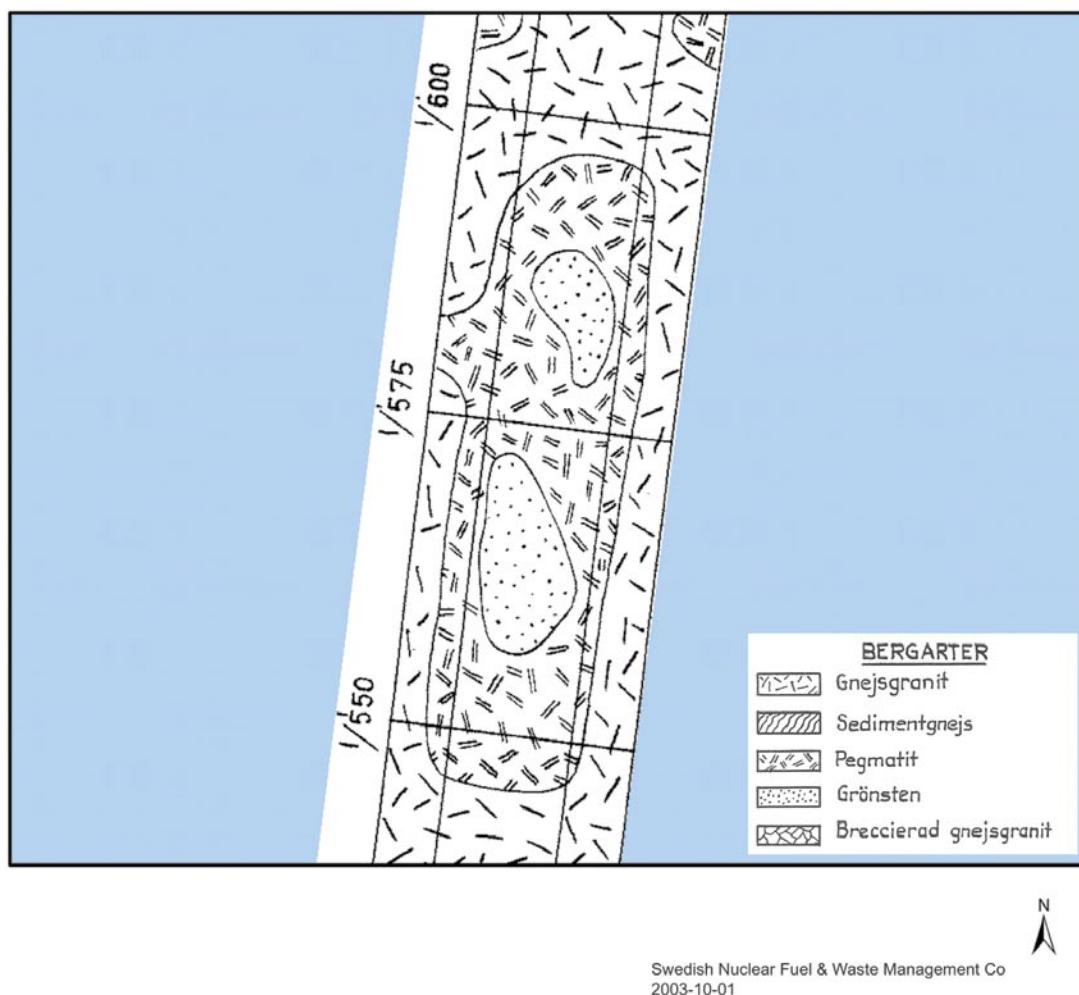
Rock type in section 1500–1600 metre, in Forsmark tunnel 1+2.
